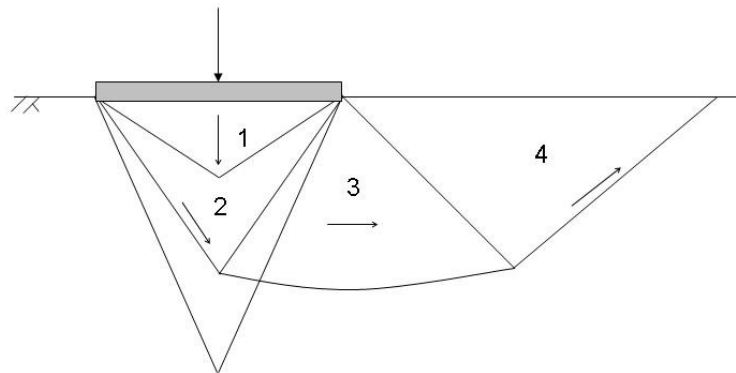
Four-zone failure mechanism for a group of stone columns (Muir Wood *et al.*, 2000).
